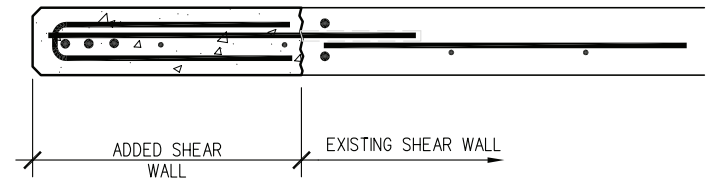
D: NEW SHEAR WALL AT EXIST. WALL
